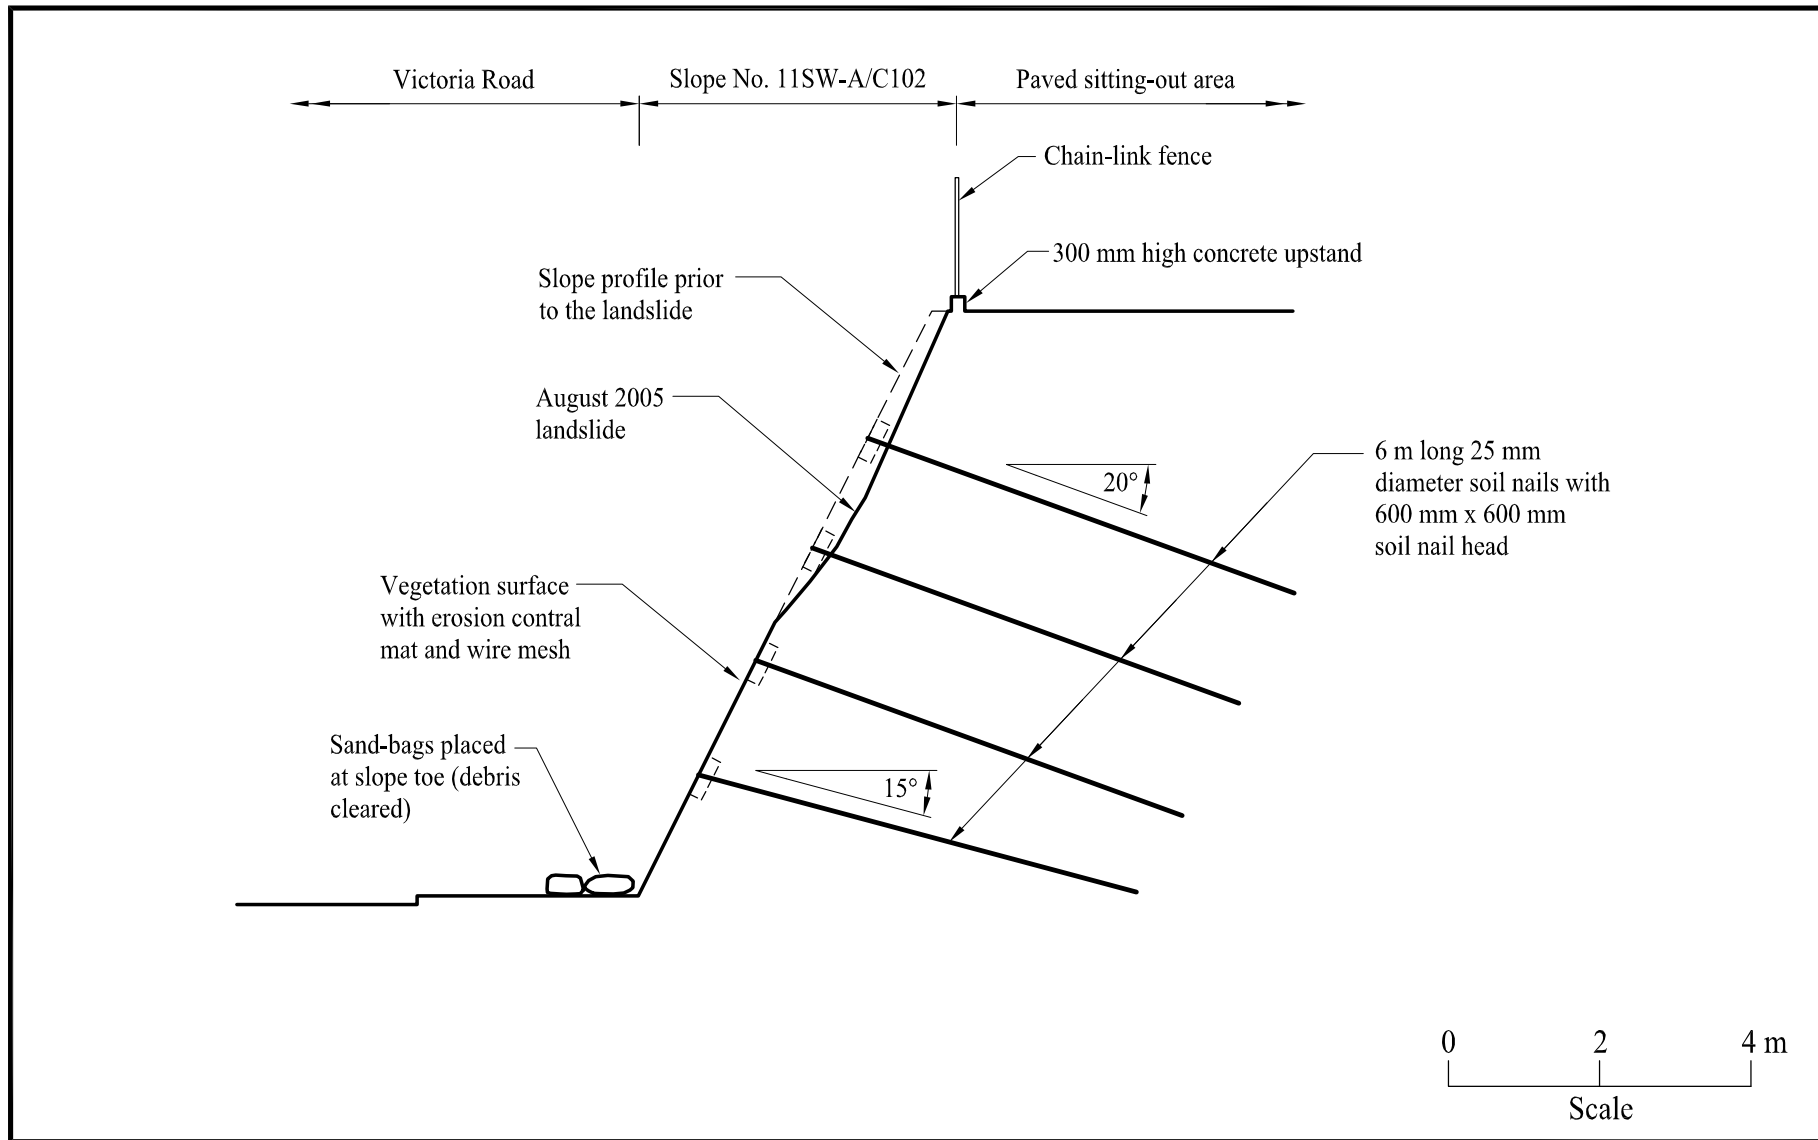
Section A - A (Slope No. 11SW-A/C102)
